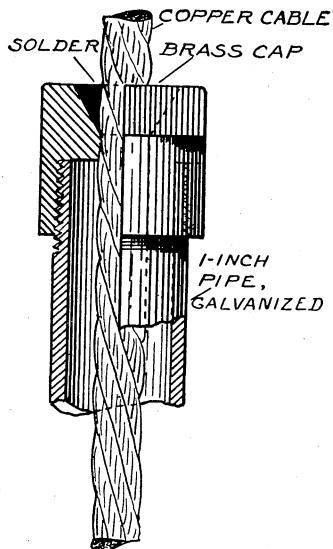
Method of electrically connecting down conductor to pipe used to protect the conductor against injury by passing vehicles, stock, etc. Conductors are also protected by a boxing of wood. The protection should extend to a height of 8 to 10 feet from the ground
